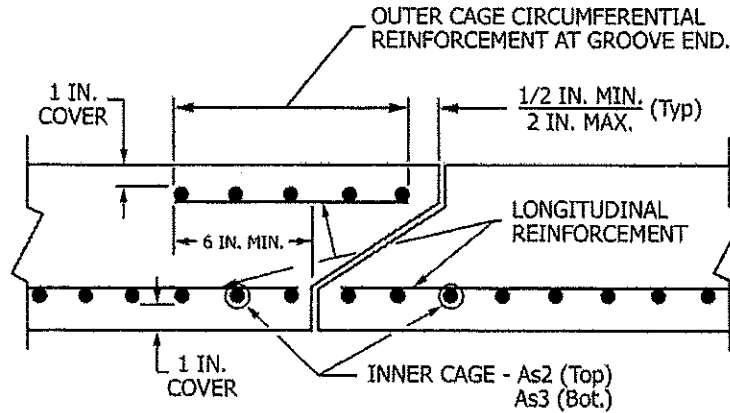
Section A-A Top and Bottom Slab Joint Reinforcement
